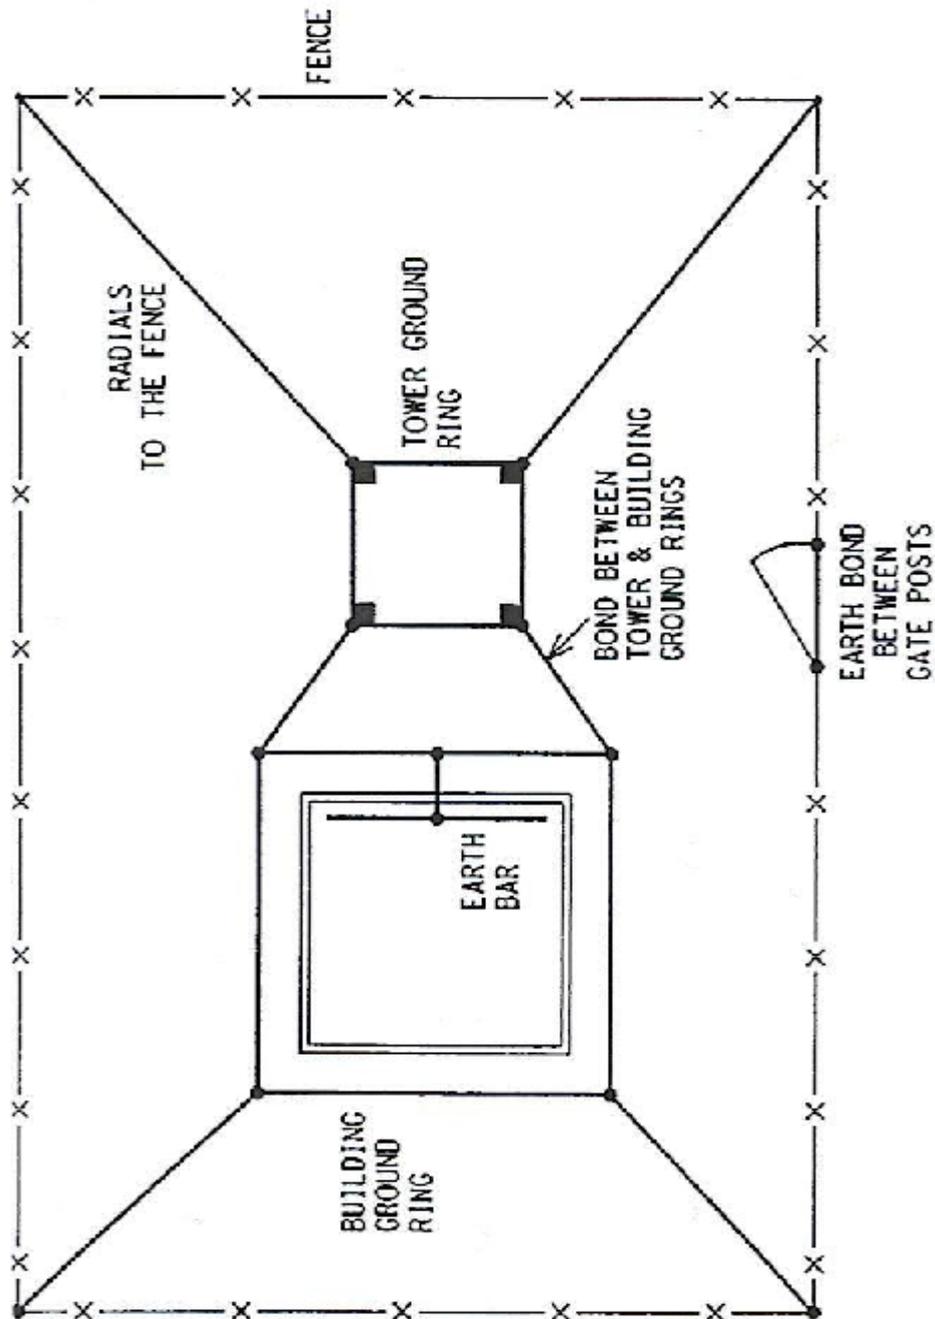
Organisation of Tower/Mast and Building – Elevation
